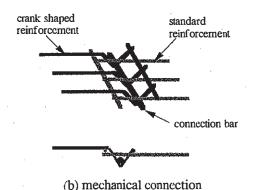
Schematic diagram of steel grid reinforcement and mechanical connection.
